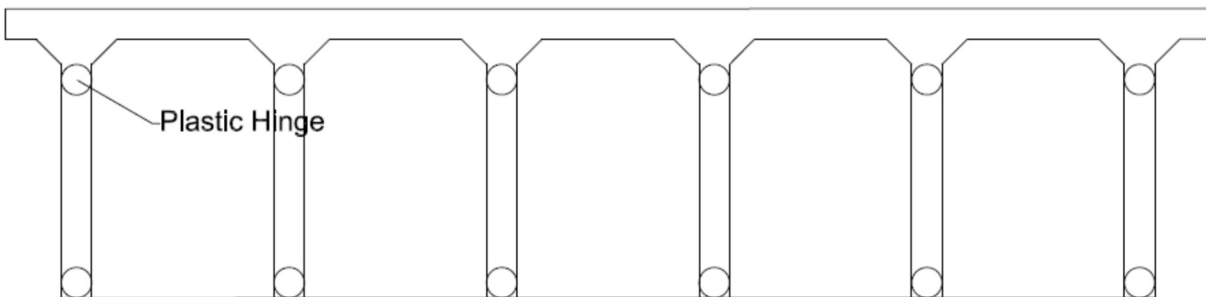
The First Mechanism of Hinge Formation: Plastic Hinges Formed at Base and Top of Columns
